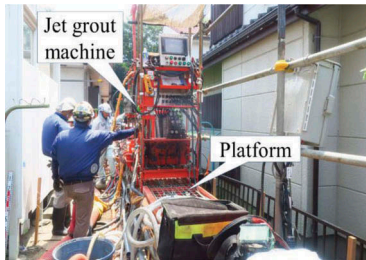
Jet grouting by a small machine placed on an elevated platform (August, 2018).
